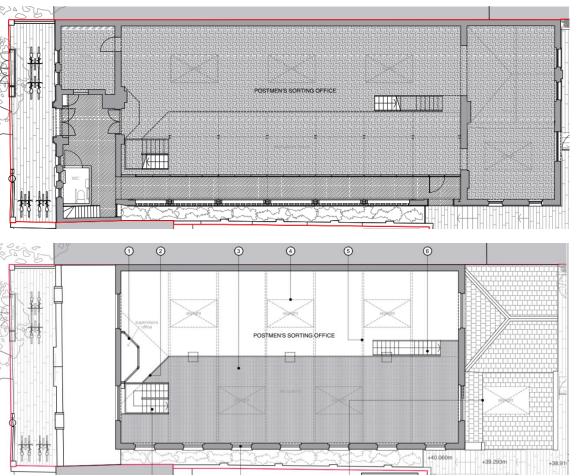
Proposed Office Plan (Ground Floor and Mezzanine) from permitted scheme 2015/4778/P and 2015/4856/L
